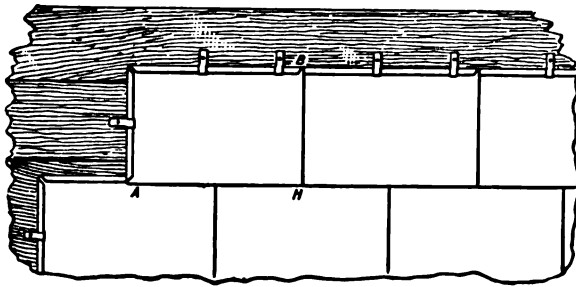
Sheets Fastened to Roofs with Cleats Properly Placed
